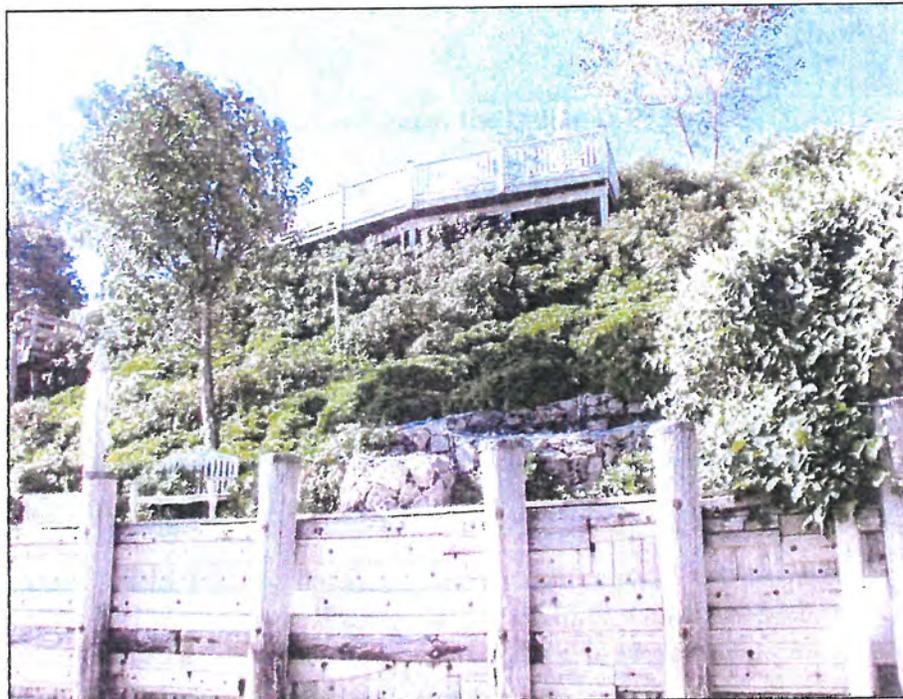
Timber bulkhead and landscaped bluff.
